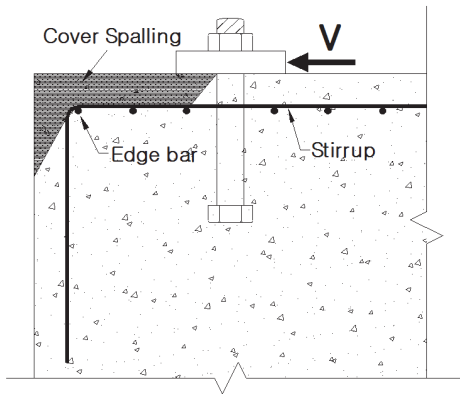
Cover spalling of stirrup reinforced anchor^[8]
